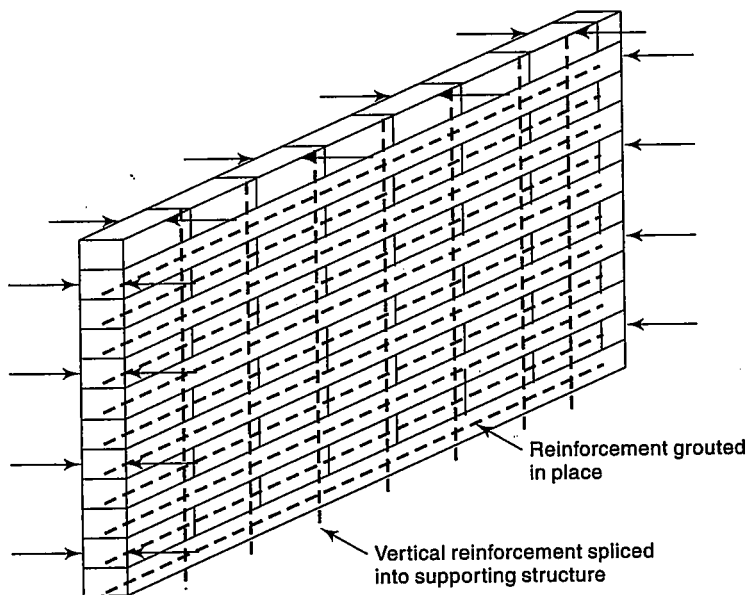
Basketting reinforcement (the arrows indicate the direction of restraint provided at the frame wall junction)
